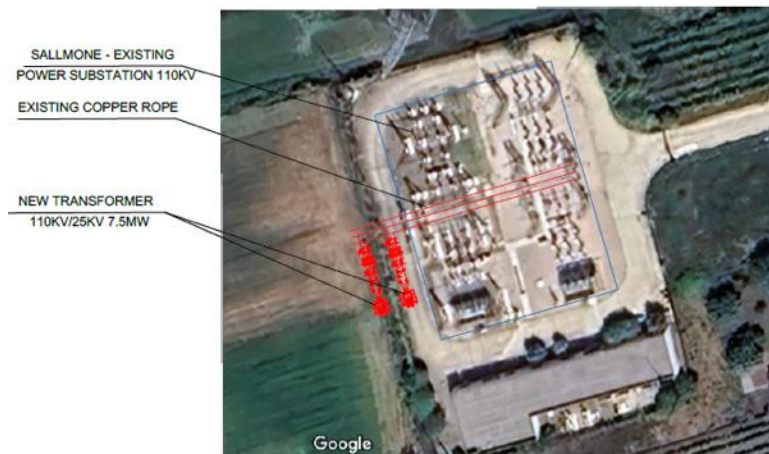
Alternative 2 New transformer 110kV/25kV inside the boundaries of existing power substation Sallmone and new 25kV facility near the railroad
